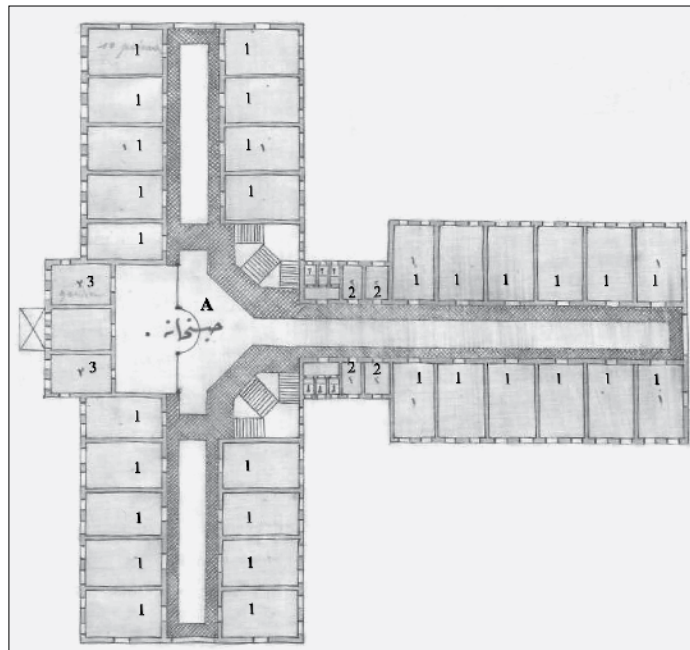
PRISON SECOND FLOOR PLAN: A – PRISON, 1 – WARD FOR 10 PRISONERS, 2 – ISOLATION CELL, ROOM FOR GUARDS
